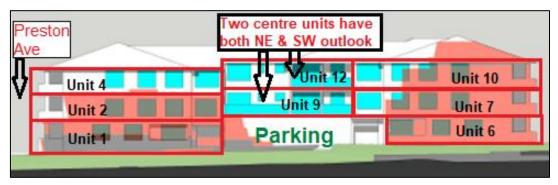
North-eastern elevation of No. 9-11 Preston Avenue
